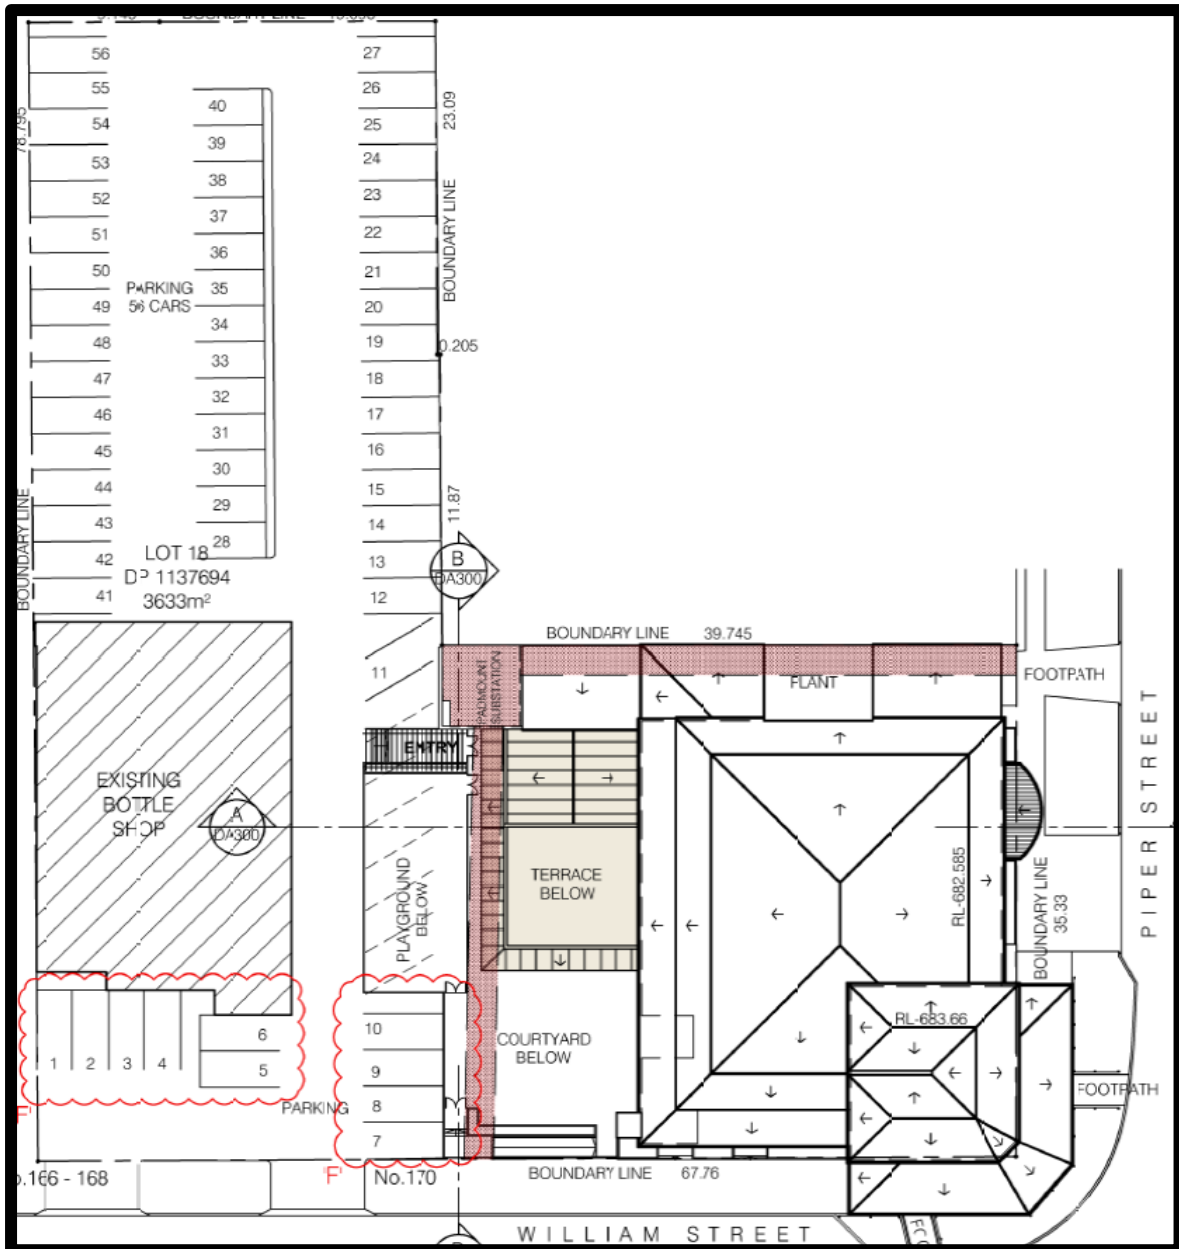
Proposed Amended Site Plan – Modification of Development Consent (No. 2020/95) Application
